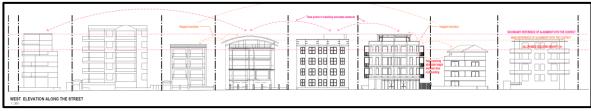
Streetscape elevation of Victoria Parade within the urban block
